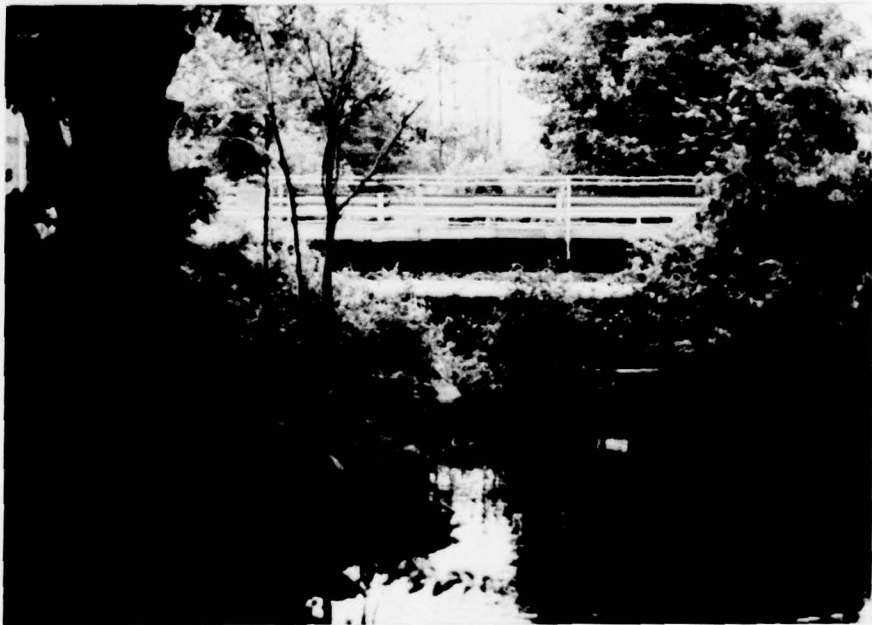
View of roadway bridge 350 feet downstream of the spillway, carrying Whittemore Avenue over Green Pond Brook. Note the steam pipe crossing the brook, and the electric cable pylon on the downstream channel bank.
